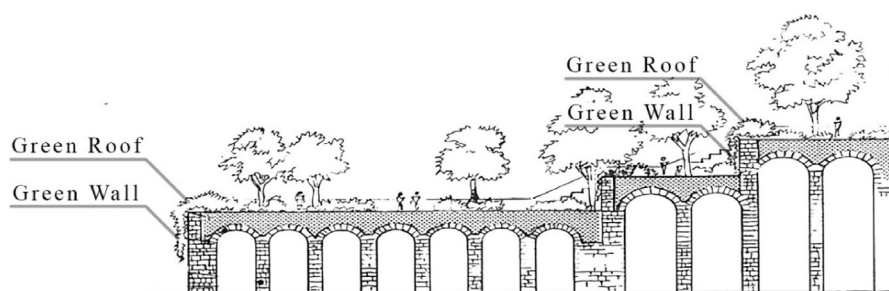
The Hanging Garden of Babylon section drawing shows vegetation as green roofs and walls. Source (Srivastava, 2011).
